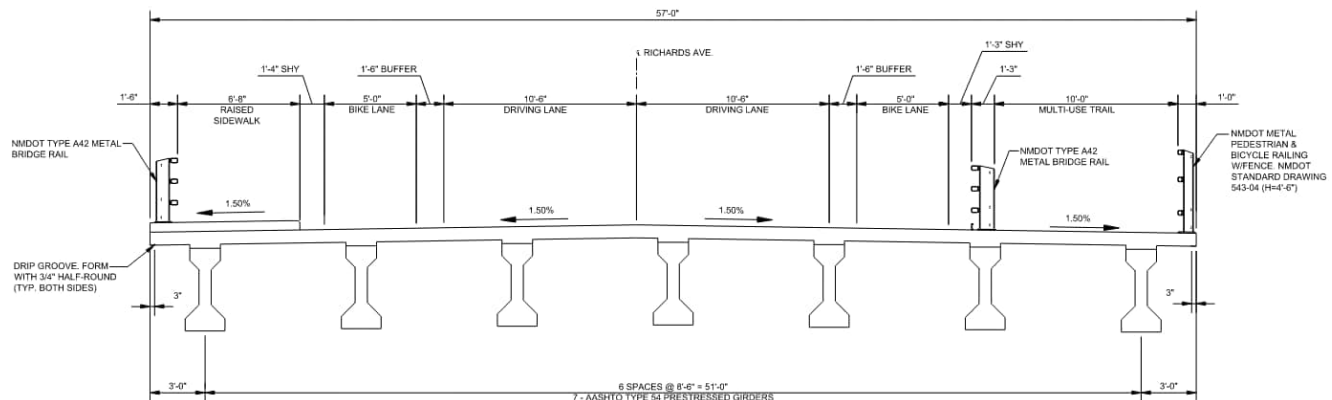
Proposed Two-Span Type 54 Prestressed Concrete Girder Typical Section
